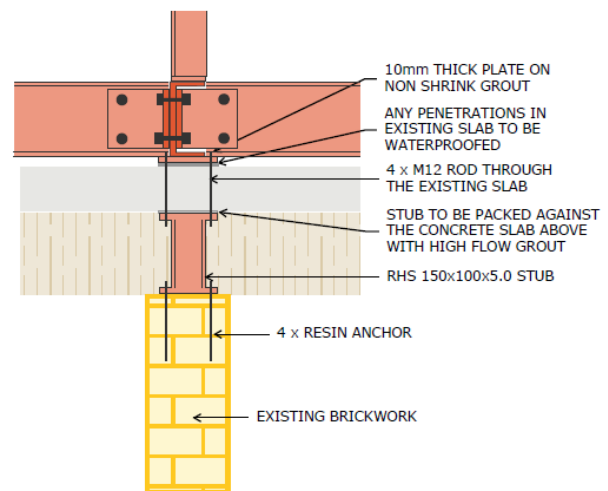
Vertical load transfer from the steel frame downward onto the brickwork below, via the roof level slab and boarding.
